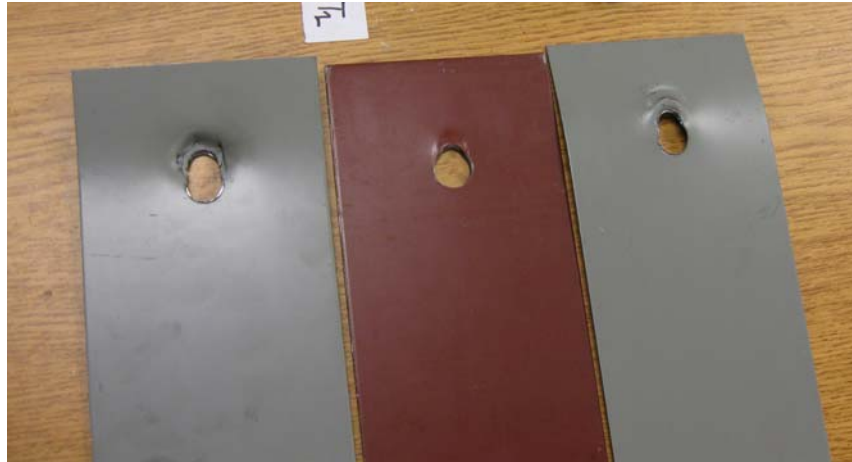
Bearing Failure of Test Specimen 94O-57S-1/2-1-D-4-T2
